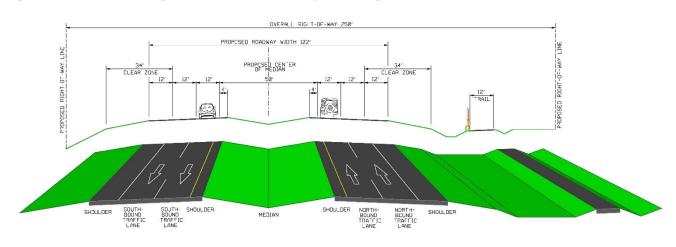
Level 2 Design Layout for West Bypass Limited Access with Northern Extension (WB3 FF)
